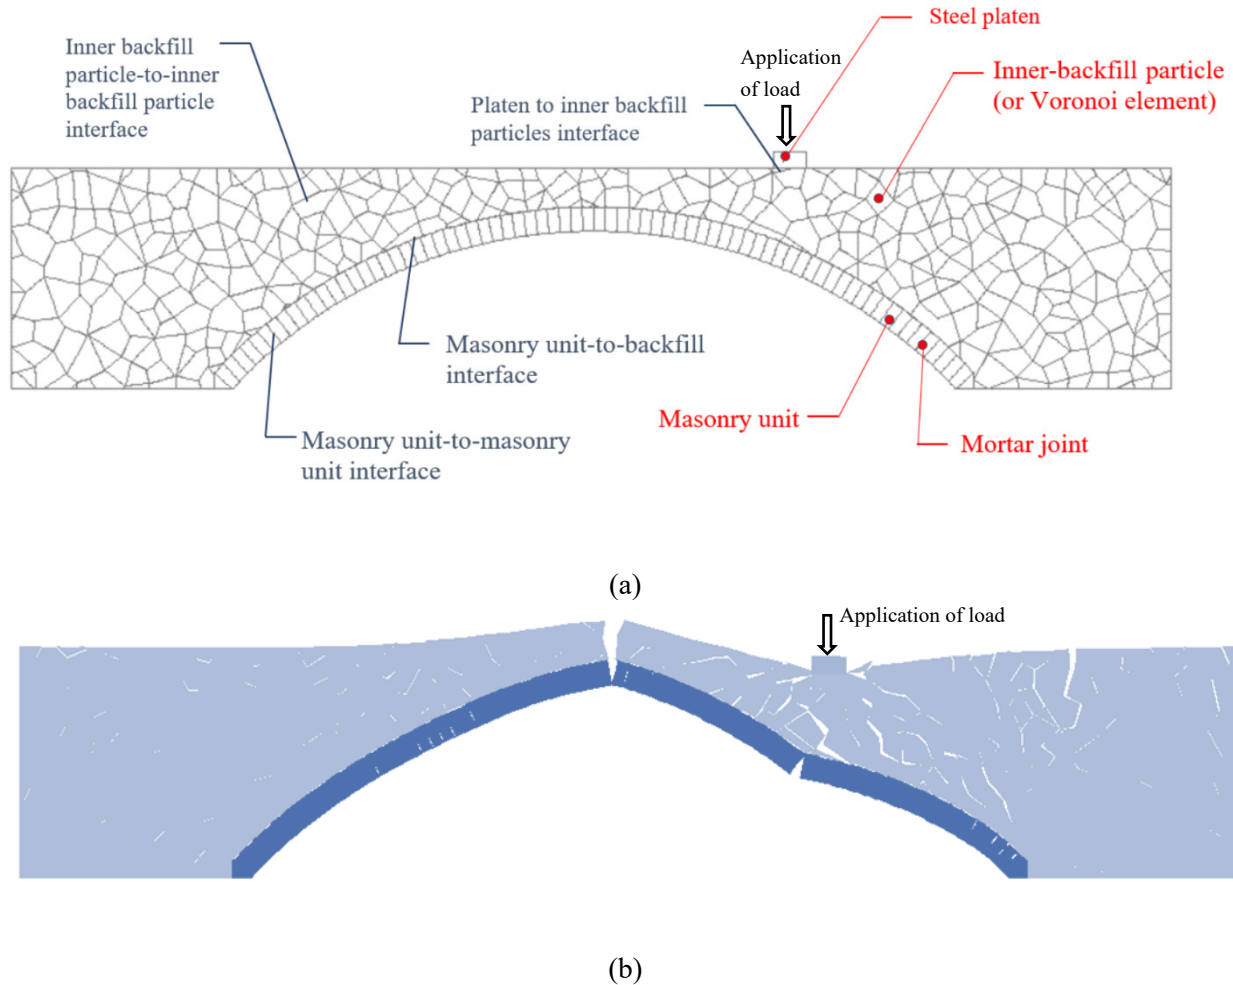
(a) Representation of backfill in a masonry arch bridge as a series of polygonal particles; (b) Failure mode of a masonry arch bridge showing cracking both in voussoirs and backfill.
